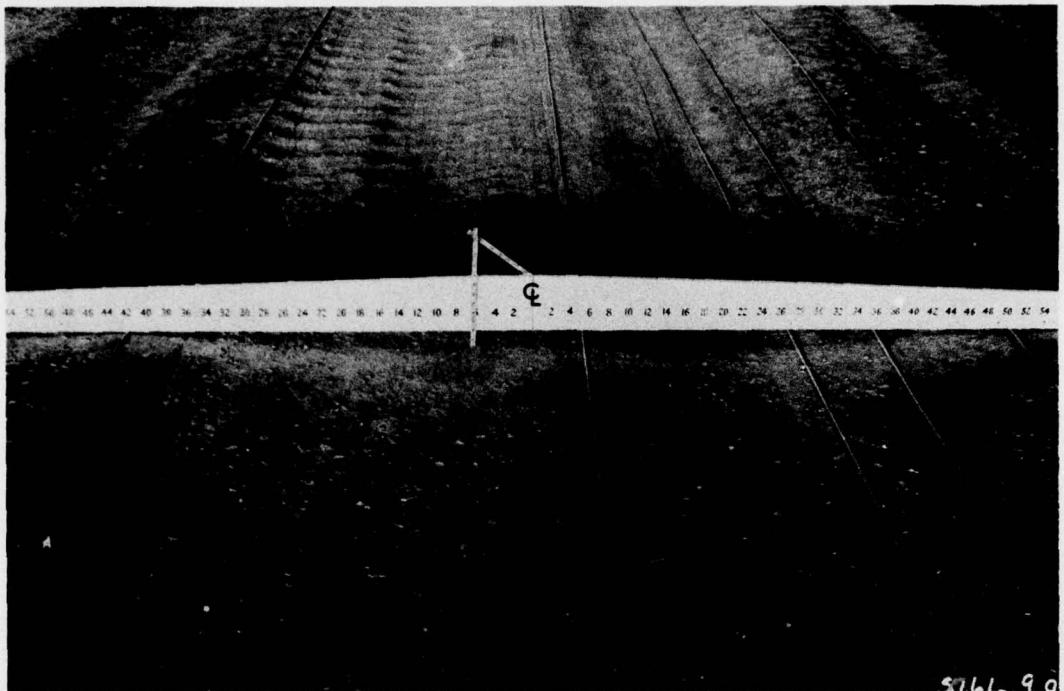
Test Section No. 4, item 2, after 480 passes of load wheel
